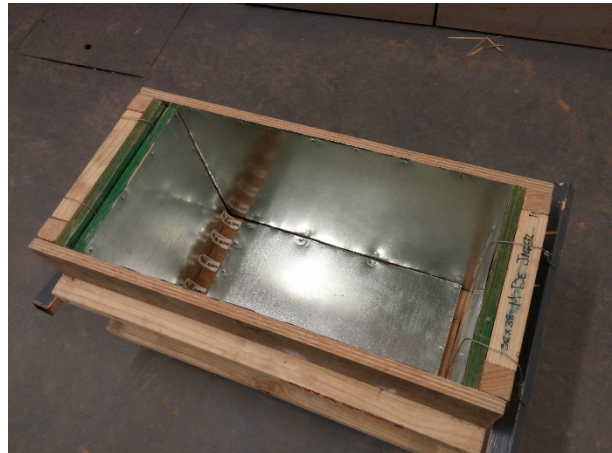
Galvanised steel sheeting added to insides of the wooden box
